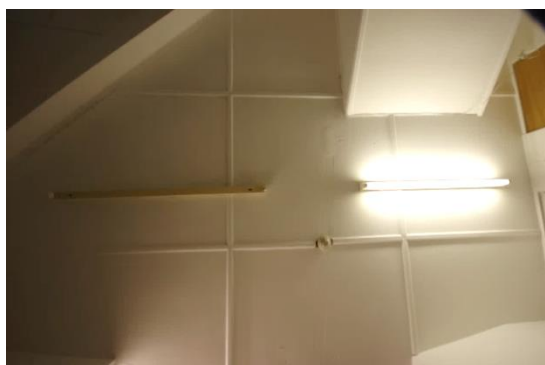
Room 3: Staff room (former men's toilets) ceiling.
